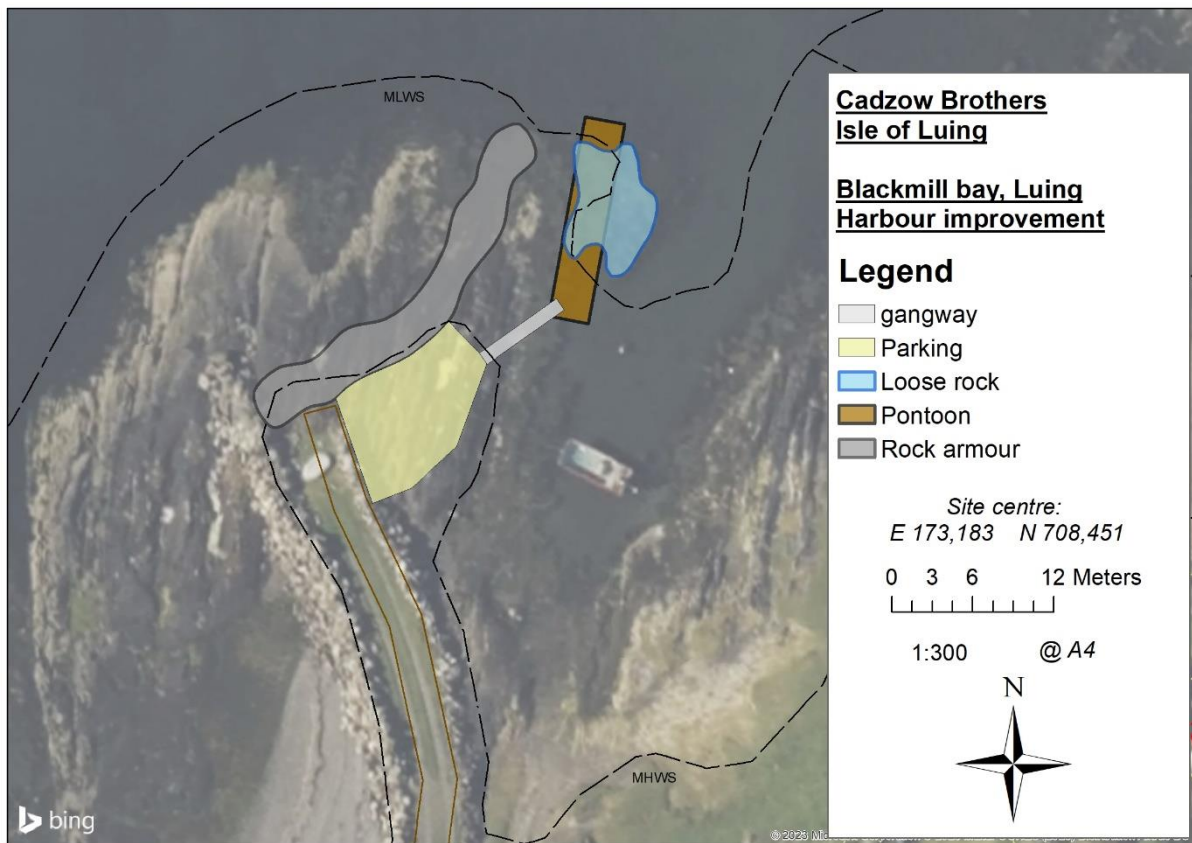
Site plan of proposed works overlaid on satellite imagery with MHWS & MLWS
